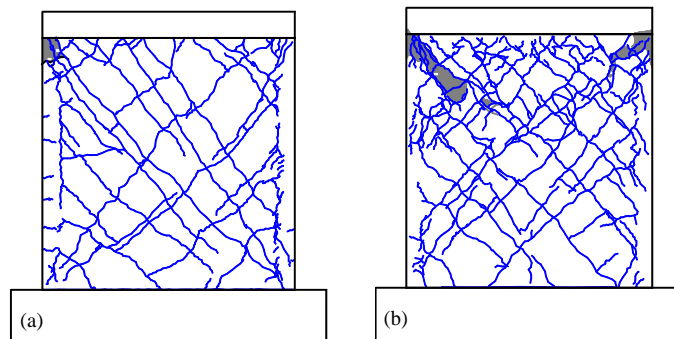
final crack patterns: (a) wall with $h_w/l_w = 1.0$, 50% of ρ_{min} and using welded-wire mesh (DT failure), (b) wall with $h_w/l_w = 1.0$, 100% of ρ_{min} and using deformed bars (DT-DC failure).
